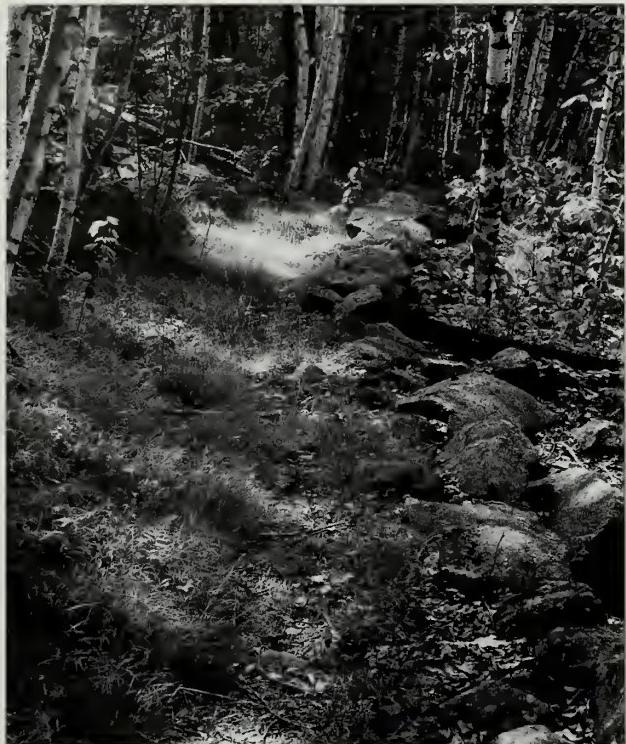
A classic example of original coping retaining wall on the Wild Gardens Path (#354) using large single boulders for retention.
